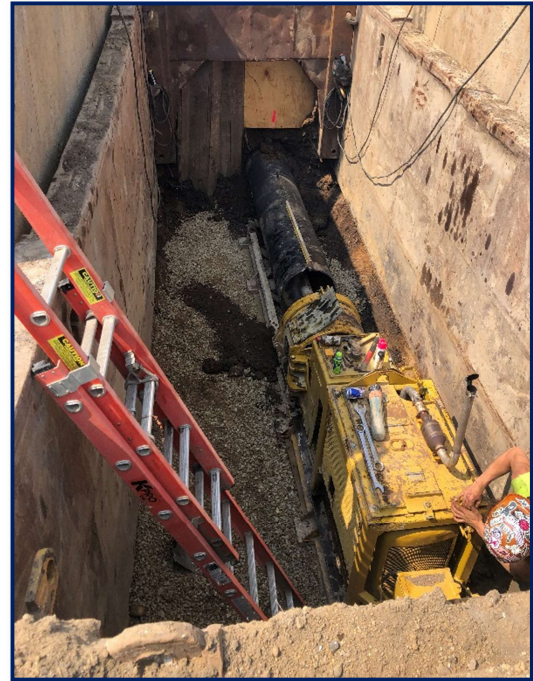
The storm sewer outfall is jack and bored near Second St. bridge
